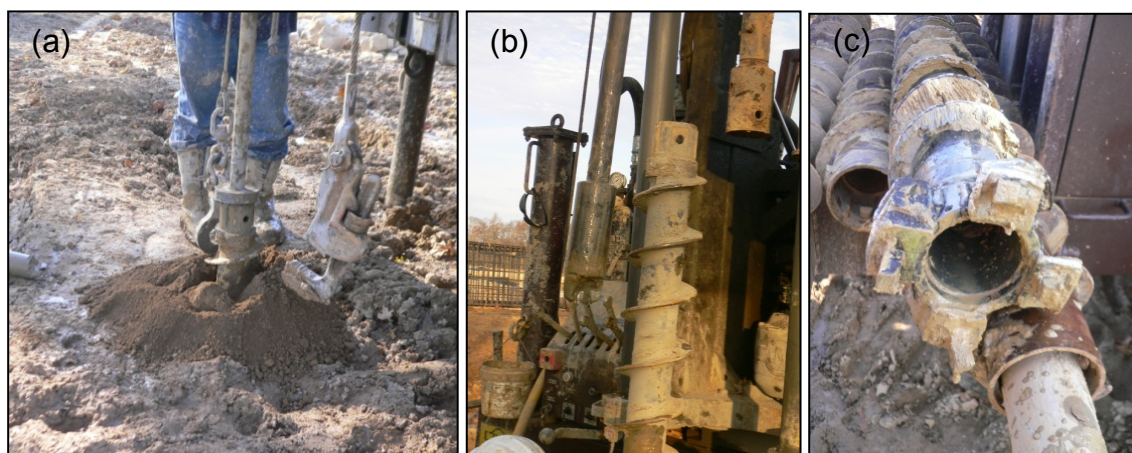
Hollow stem auger: (a) drilling with continuous-flight augers, (b) auger flight and drive cap of the drilling rig and (c) cutter head
